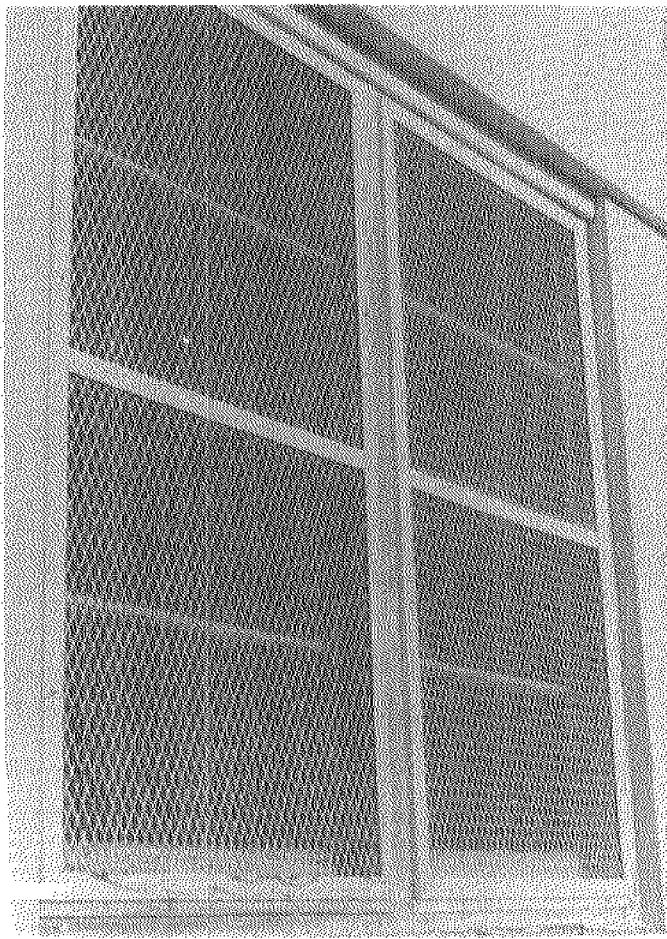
Expanded Mesh Grilles Will Not Protect Windows Against Small Missiles
